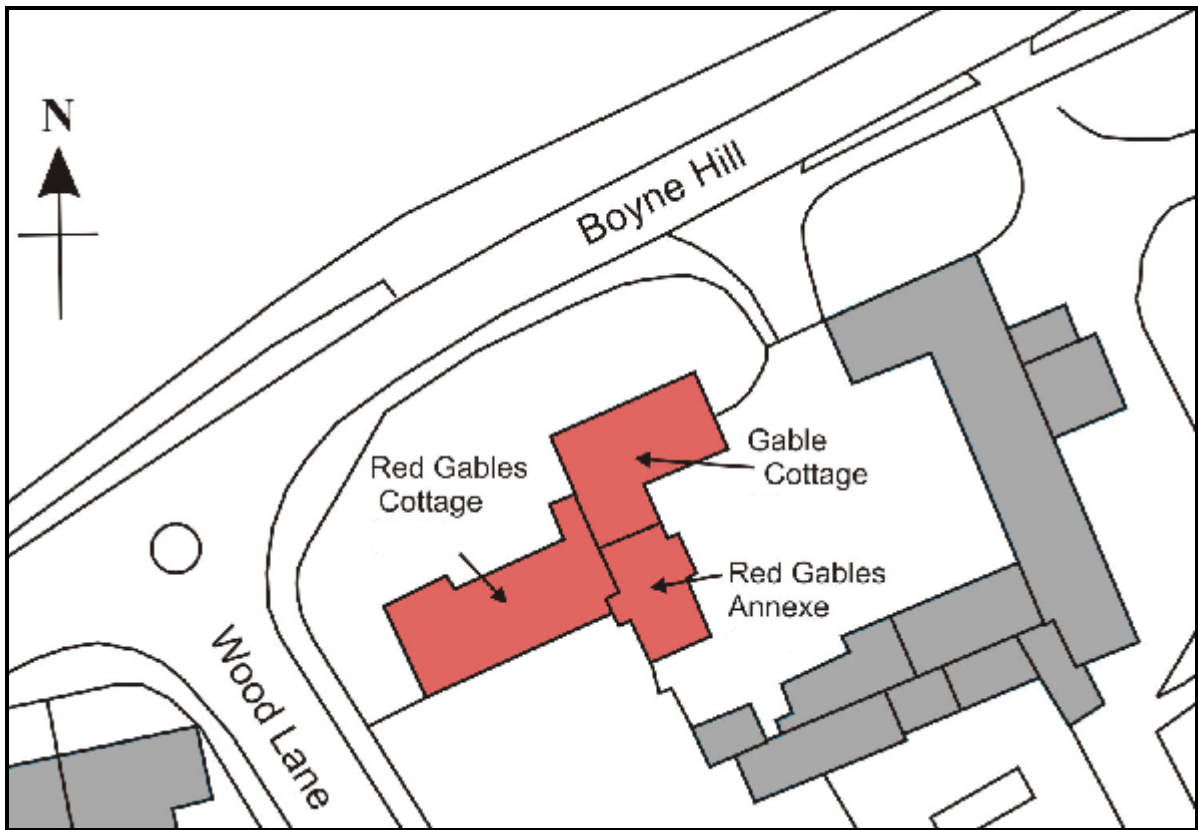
Plan to show layout and arrangement of the Red Gables Cottage site (after Pre-Construct Archaeological Services Ltd report Ref 716)
